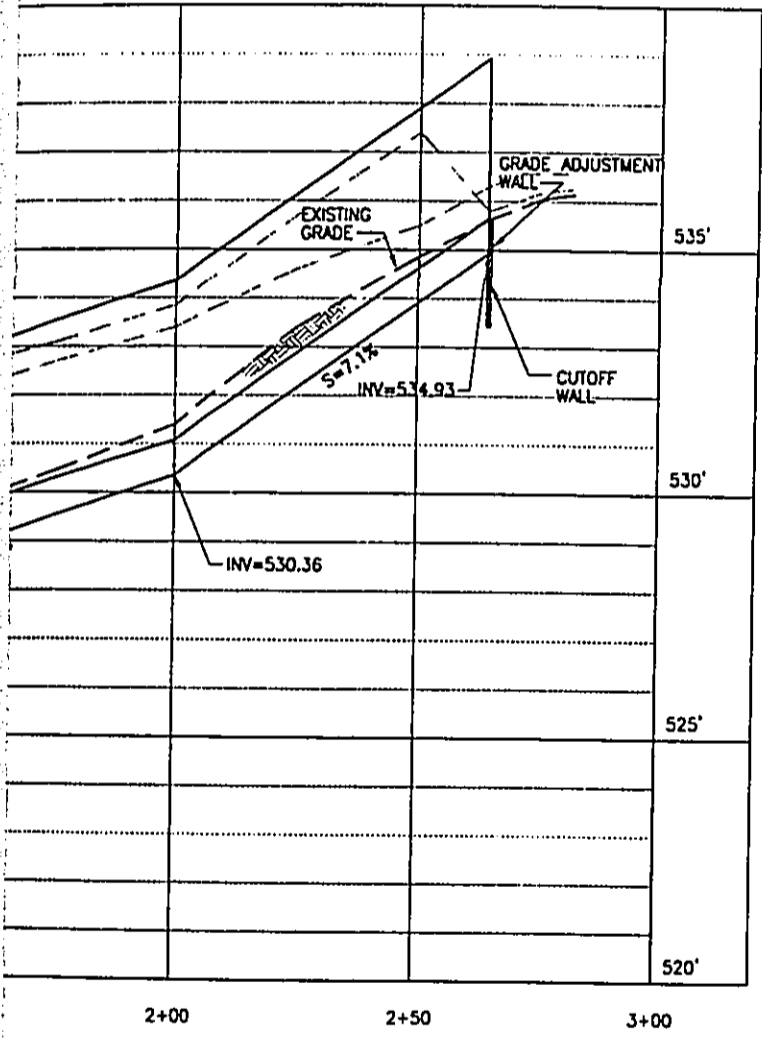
Profile of New Concrete-lined Rectangular Ditch B
